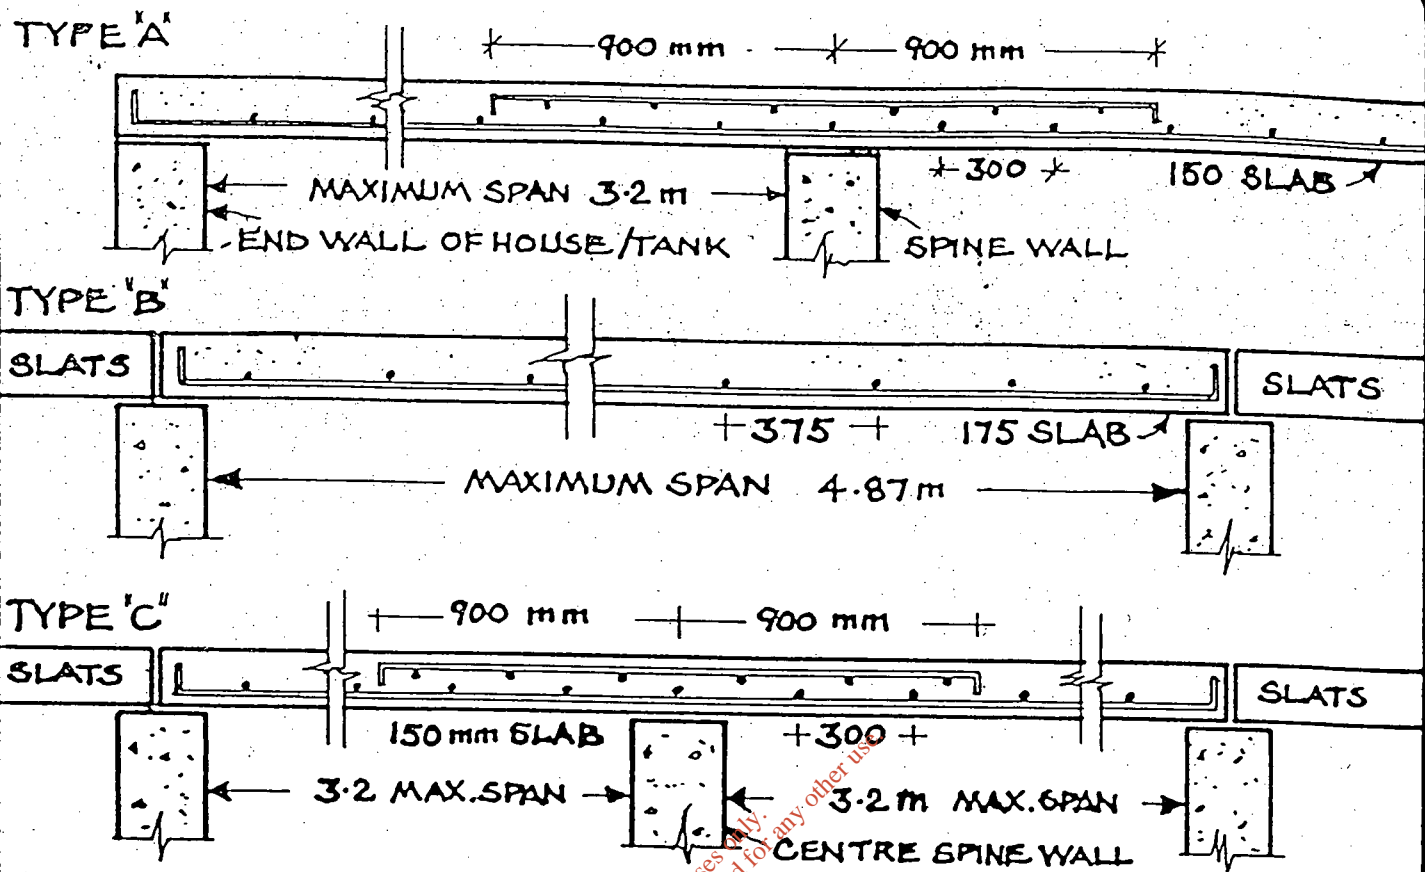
SUSPENDED SLABS : STEEL DETAILS
